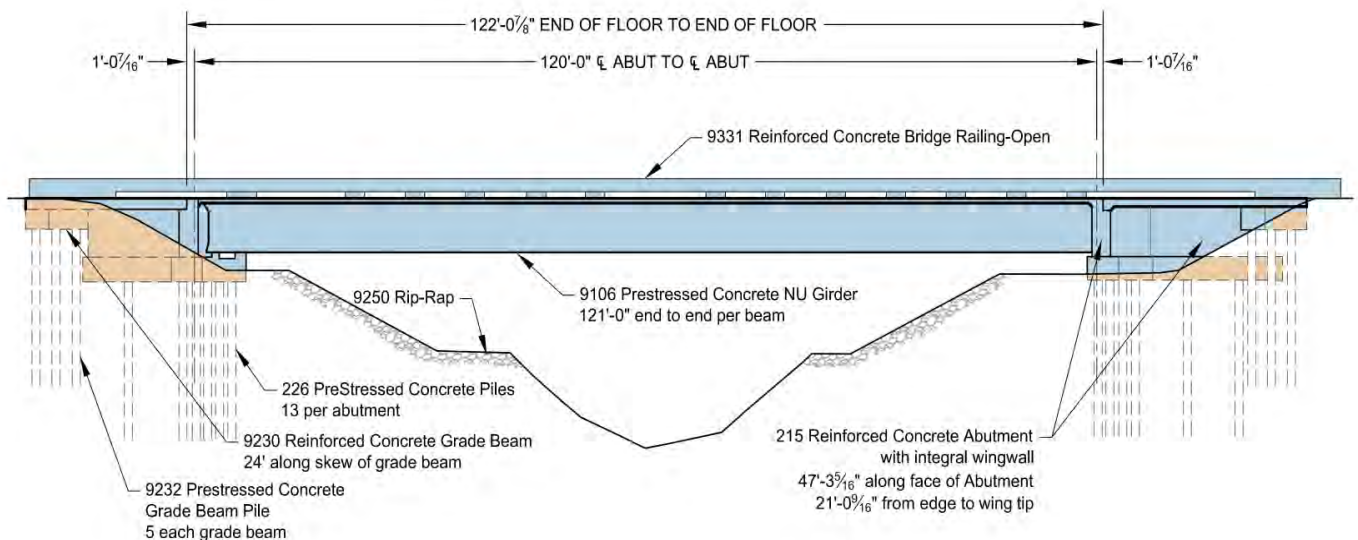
EI.24.5- 1: Elevation view of simple prestressed concrete beam bridge
